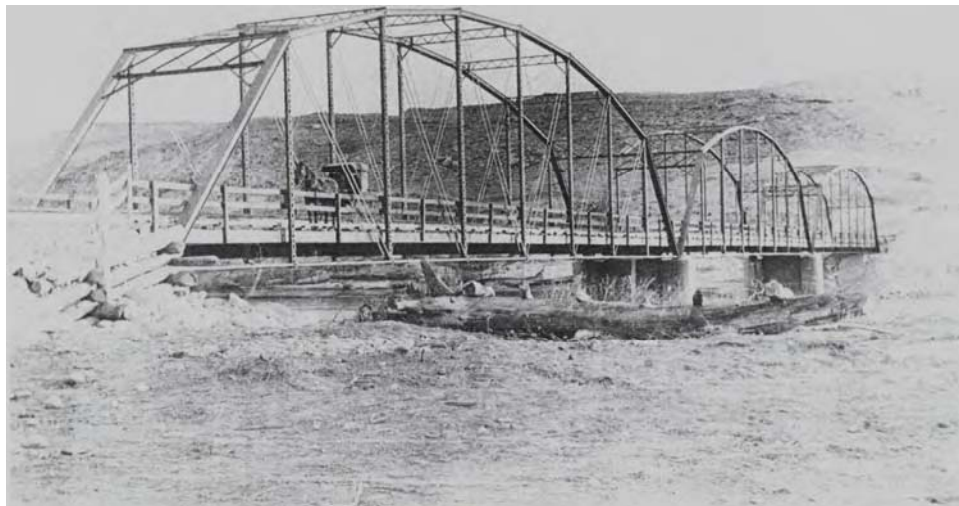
Undated photograph of completed bridge. The deck timbers can be seen in place over the timber stringers and the wood rail can be seen. The view is from north to south. The north approach consists of backfill, contained by log wing walls. (Photo courtesy of Museum of Western Colorado).
